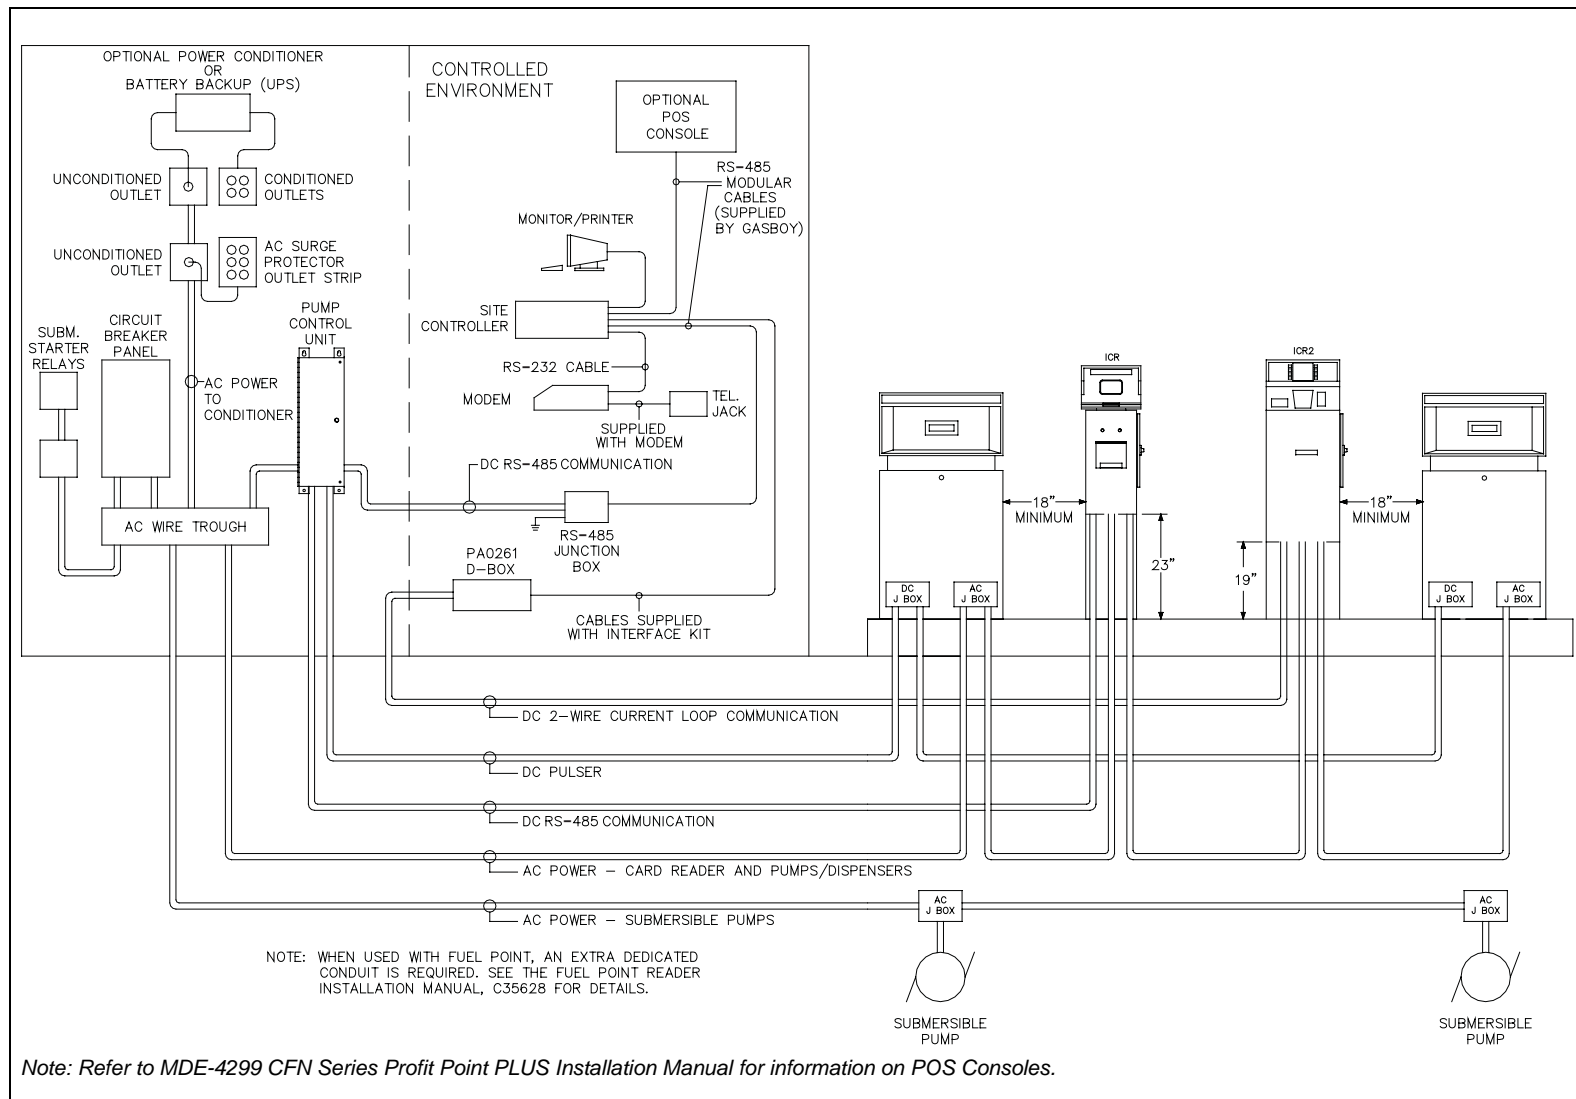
Conduit Layout - Pump Control Post, Mechanical Hose Outlets
